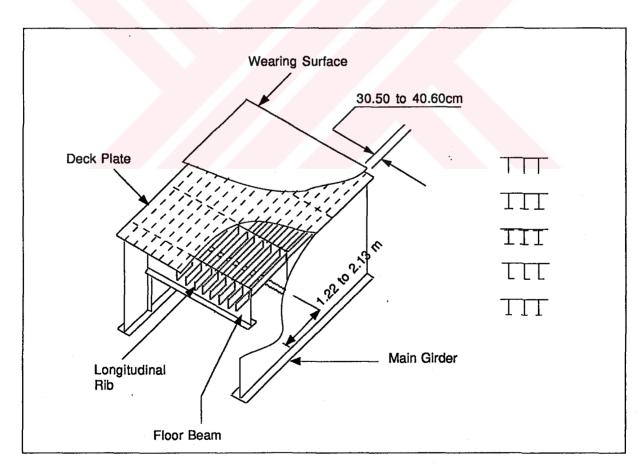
ORTOHOTROPIC DECK BRIDGES; OPEN RIBS
